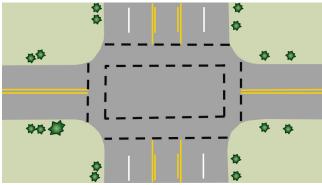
Unmarked Crosswalk Locations where Sidewalks/Shoulders Not Present
